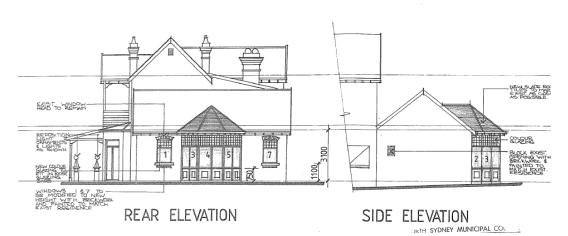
Extract from BA 546/228 showing rear (north) elevation and side (east) elevation of the rear wing with addition of bay window and alterations to original/early windows. (Source: North Sydney Council archives)
